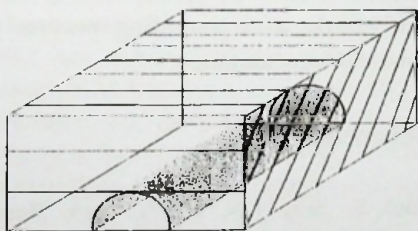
Strike of joint plane perpendicular to tunnel axis with dip angle 60°.
